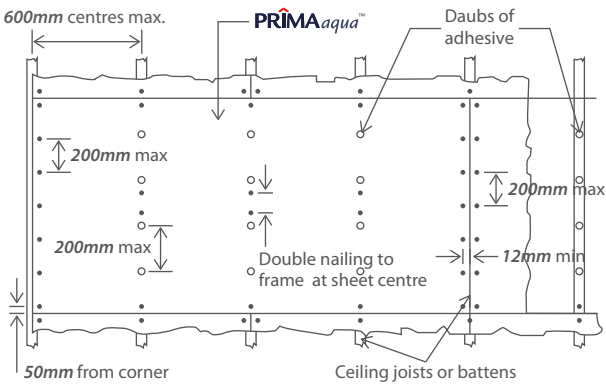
PRIMA<sup>aqua</sup>™ Ceiling - Fastener and Adhesive Fixed
